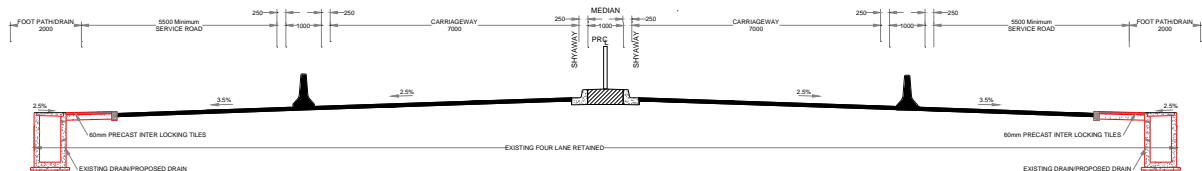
TYPICAL CROSS SECTION- TYPE-9
